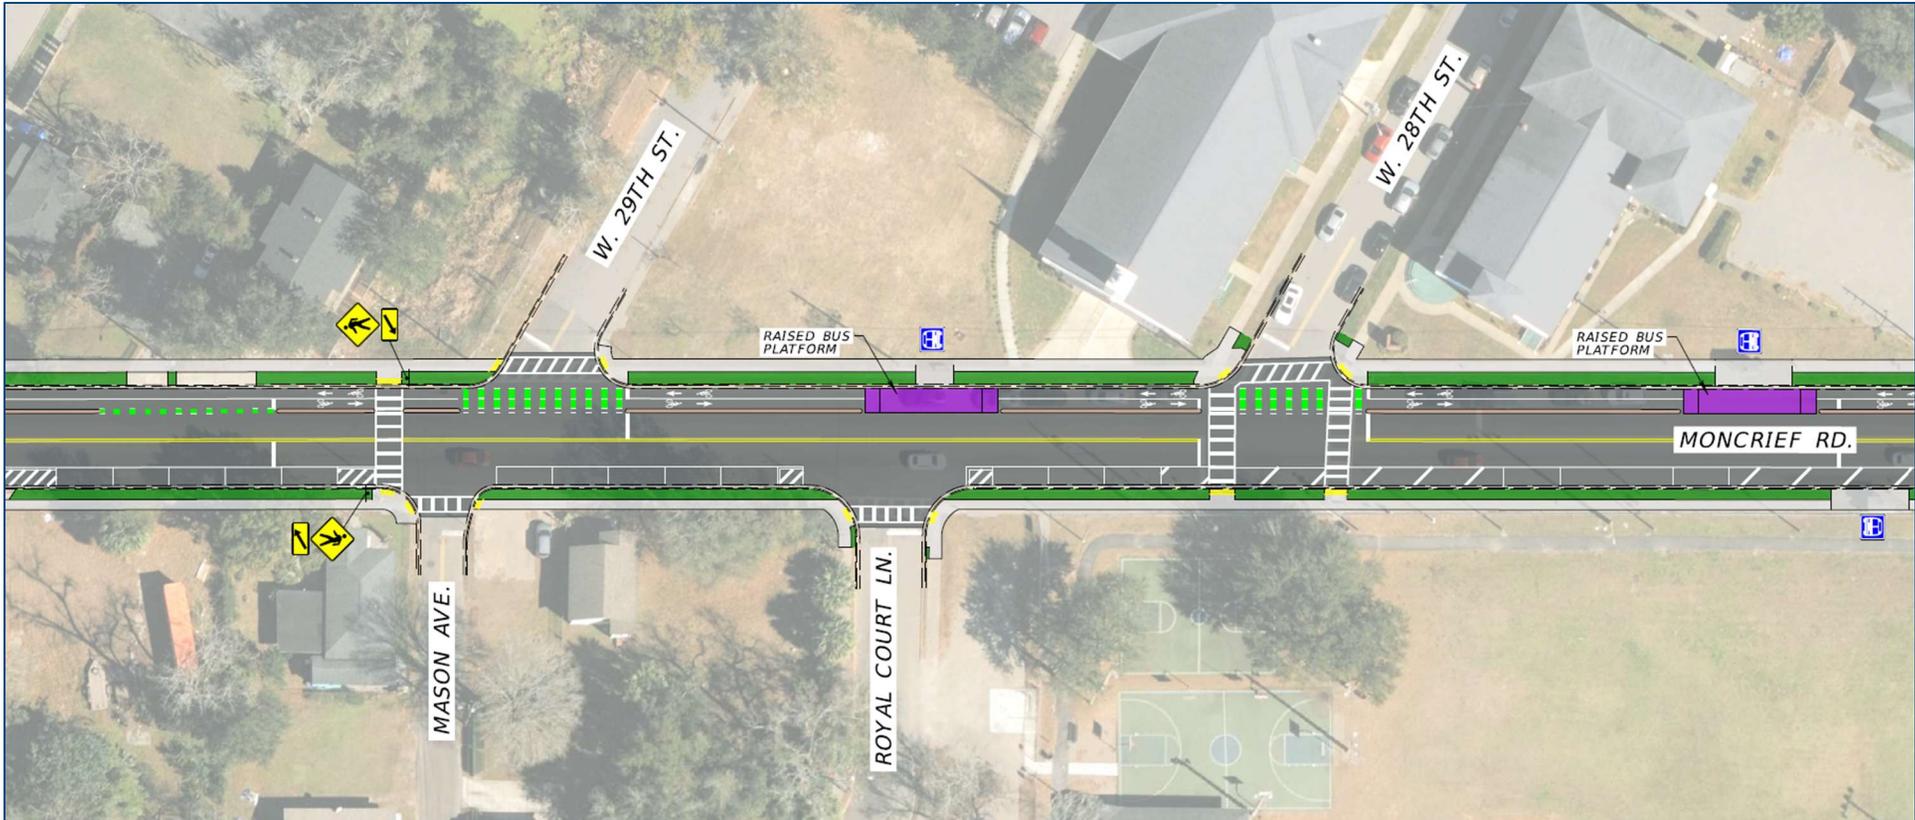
Detail of Concept Roll Plot (W. 27th Street to W. 29th Street)
